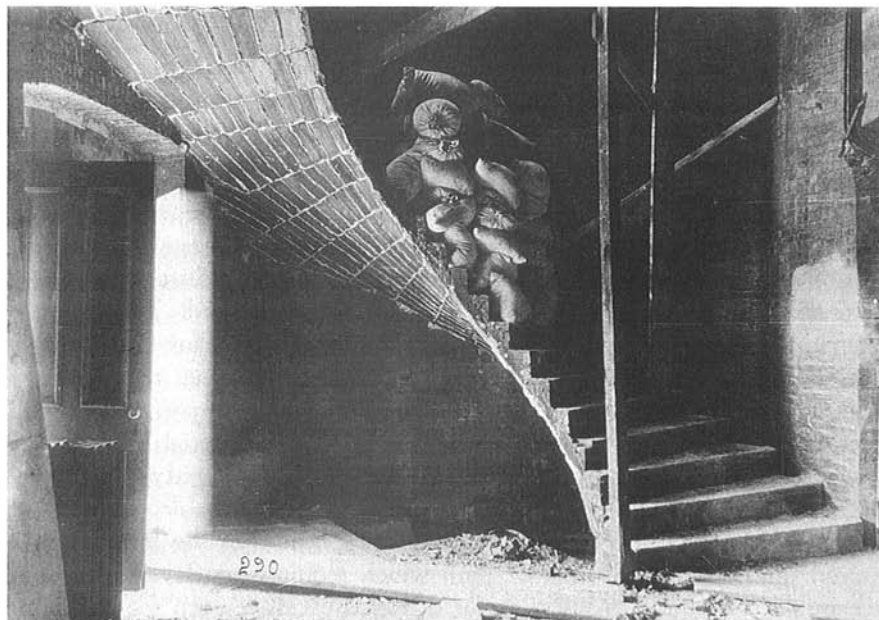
Load tests made by Guastavino in a staircase under construction, 1903
